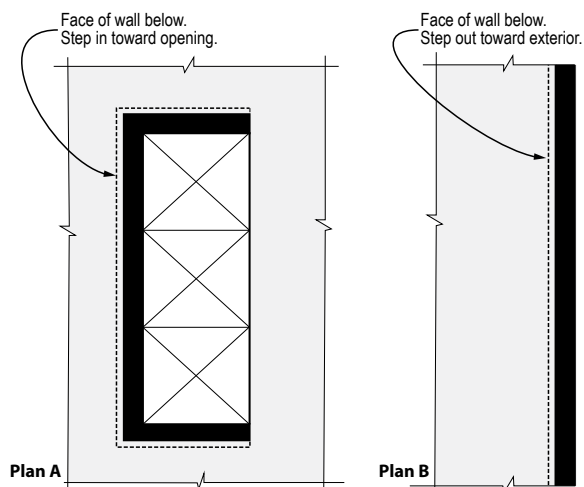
Wall faces defining opening edges and exterior of structure are normally held over the building height. Reductions in wall thickness are therefore made by shifting one form face toward an opening or the building exterior.
